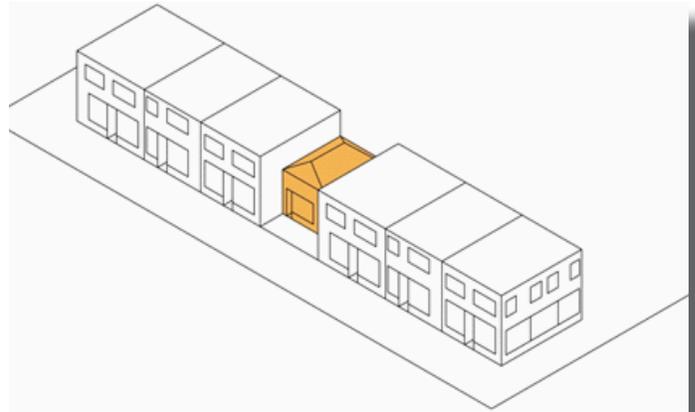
View of an existing storefront in downtown Parkville. (SRJA, 2013).
